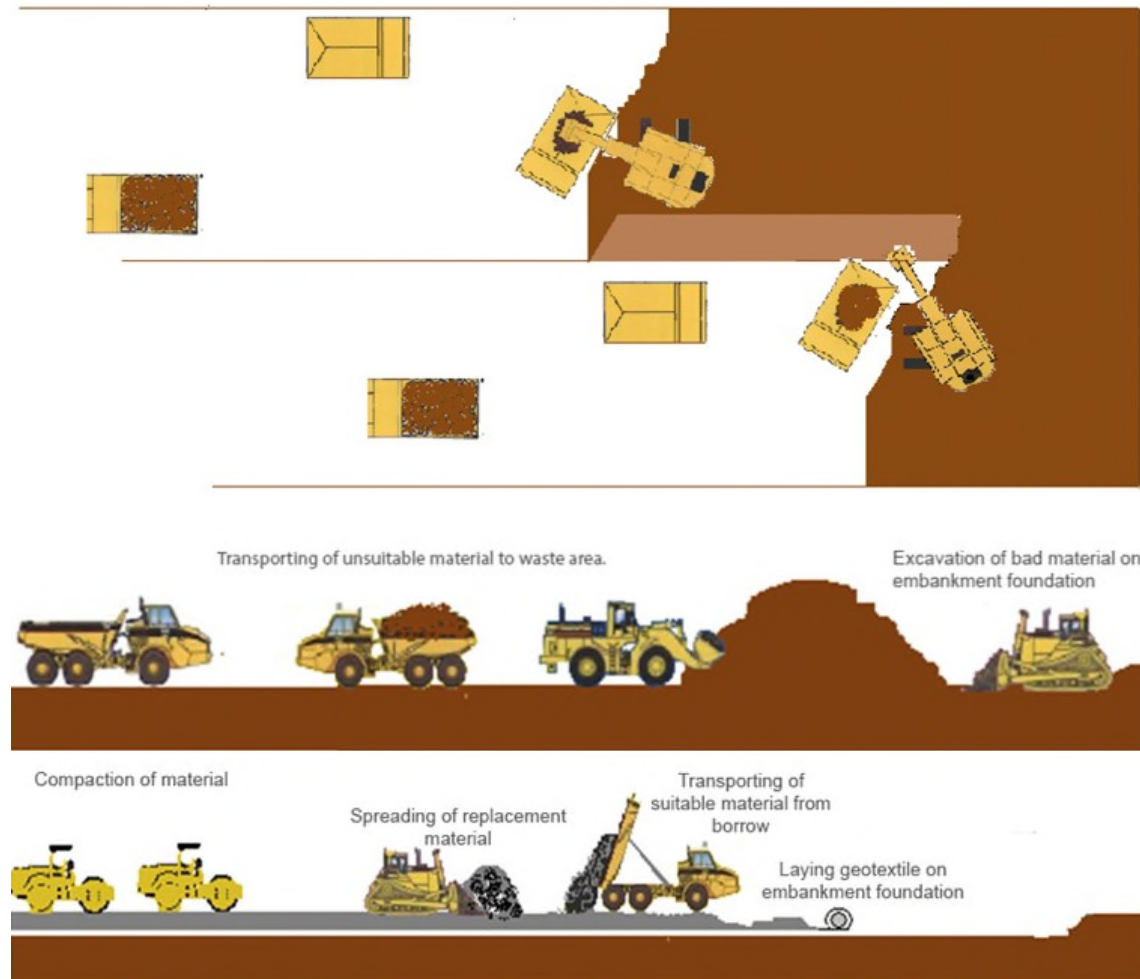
Example of Excavation and Hauling as well as Compaction Works along the Alignment
